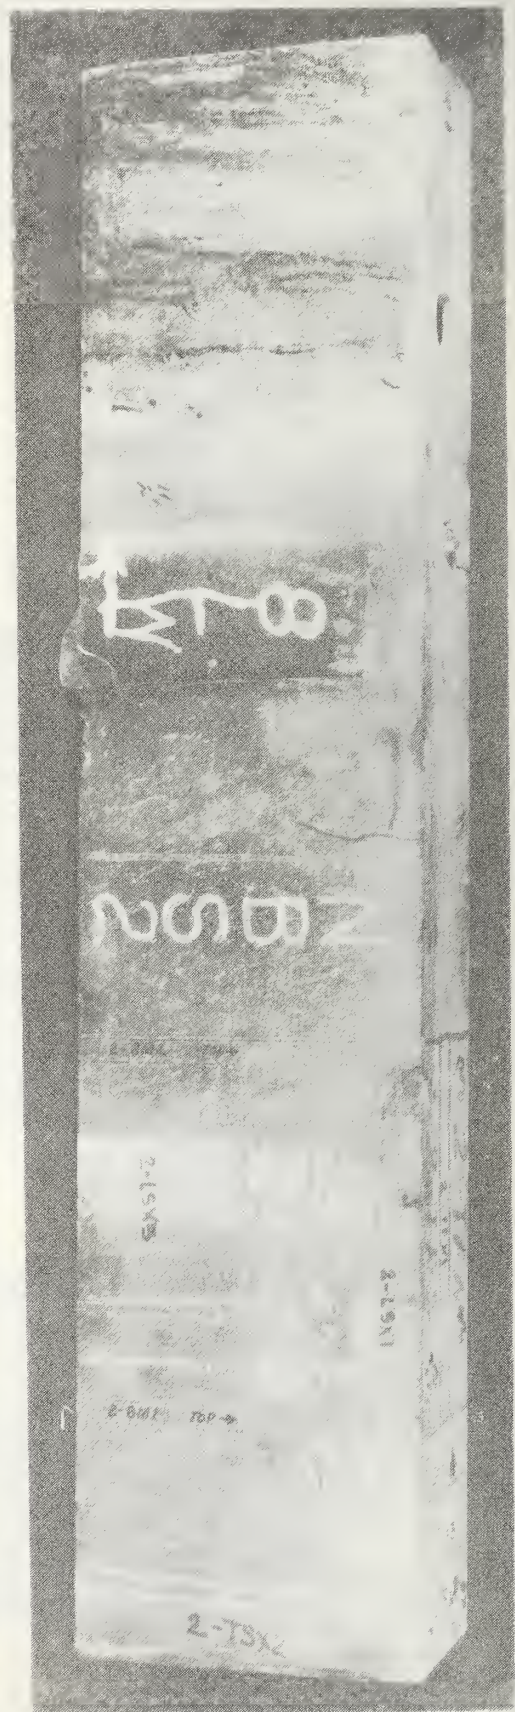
Location of test specimens from box beam segment 8L obtained from the walkway debris.
